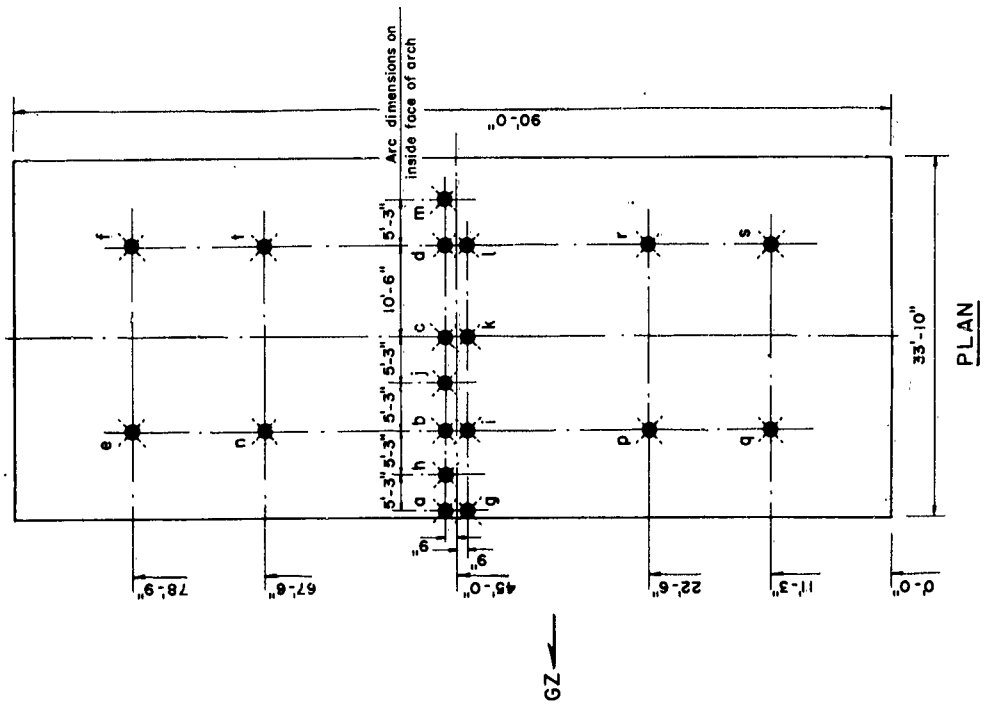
Location of instrumentation positions on nonresponding concrete arches.
